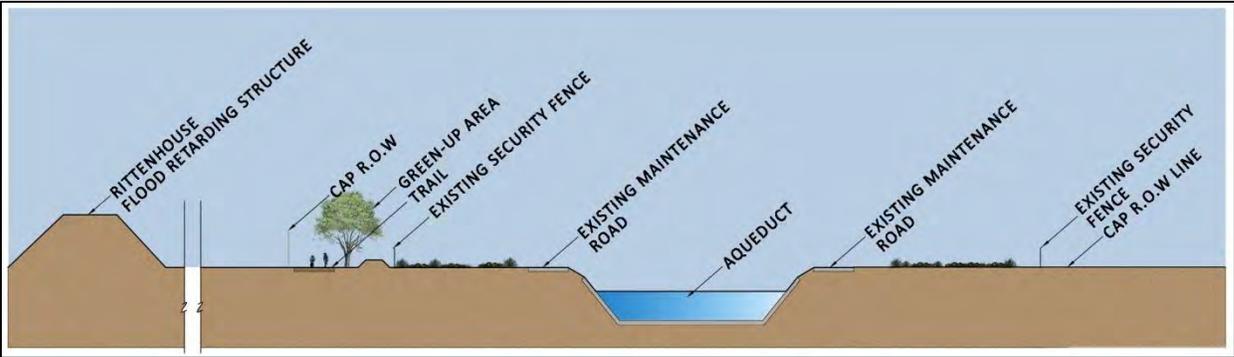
J: Cross Section AJ-4 – Typical of Mile Post 9.4 to Mile Post 9.6
